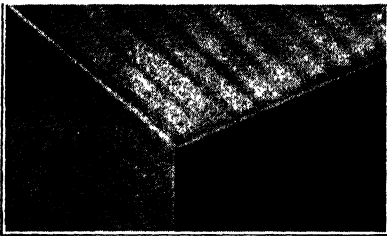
Closeup View of Corner of Room Showing Dust Deposit on the Cooler Plaster Surfaces between Laths
